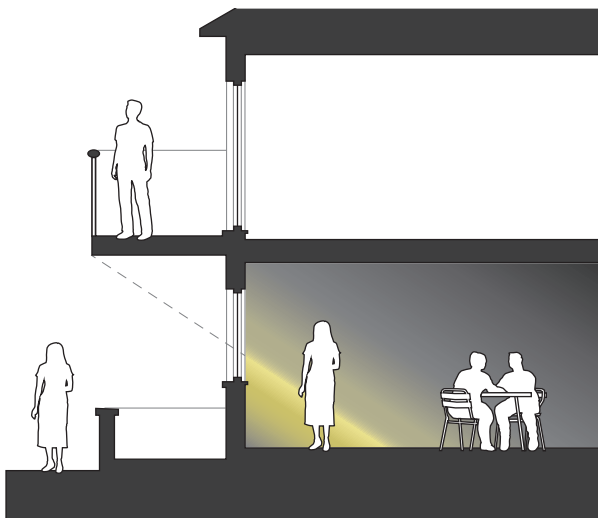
Balconies and projecting access ways can restrict daylight to rooms lit by windows below them
